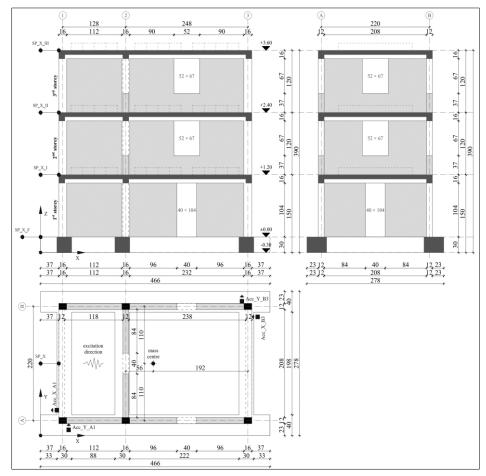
Longitudinal (top left), transverse (top right) and instrument plan views of the Series 1 build. (All dim. in cm) [25]
